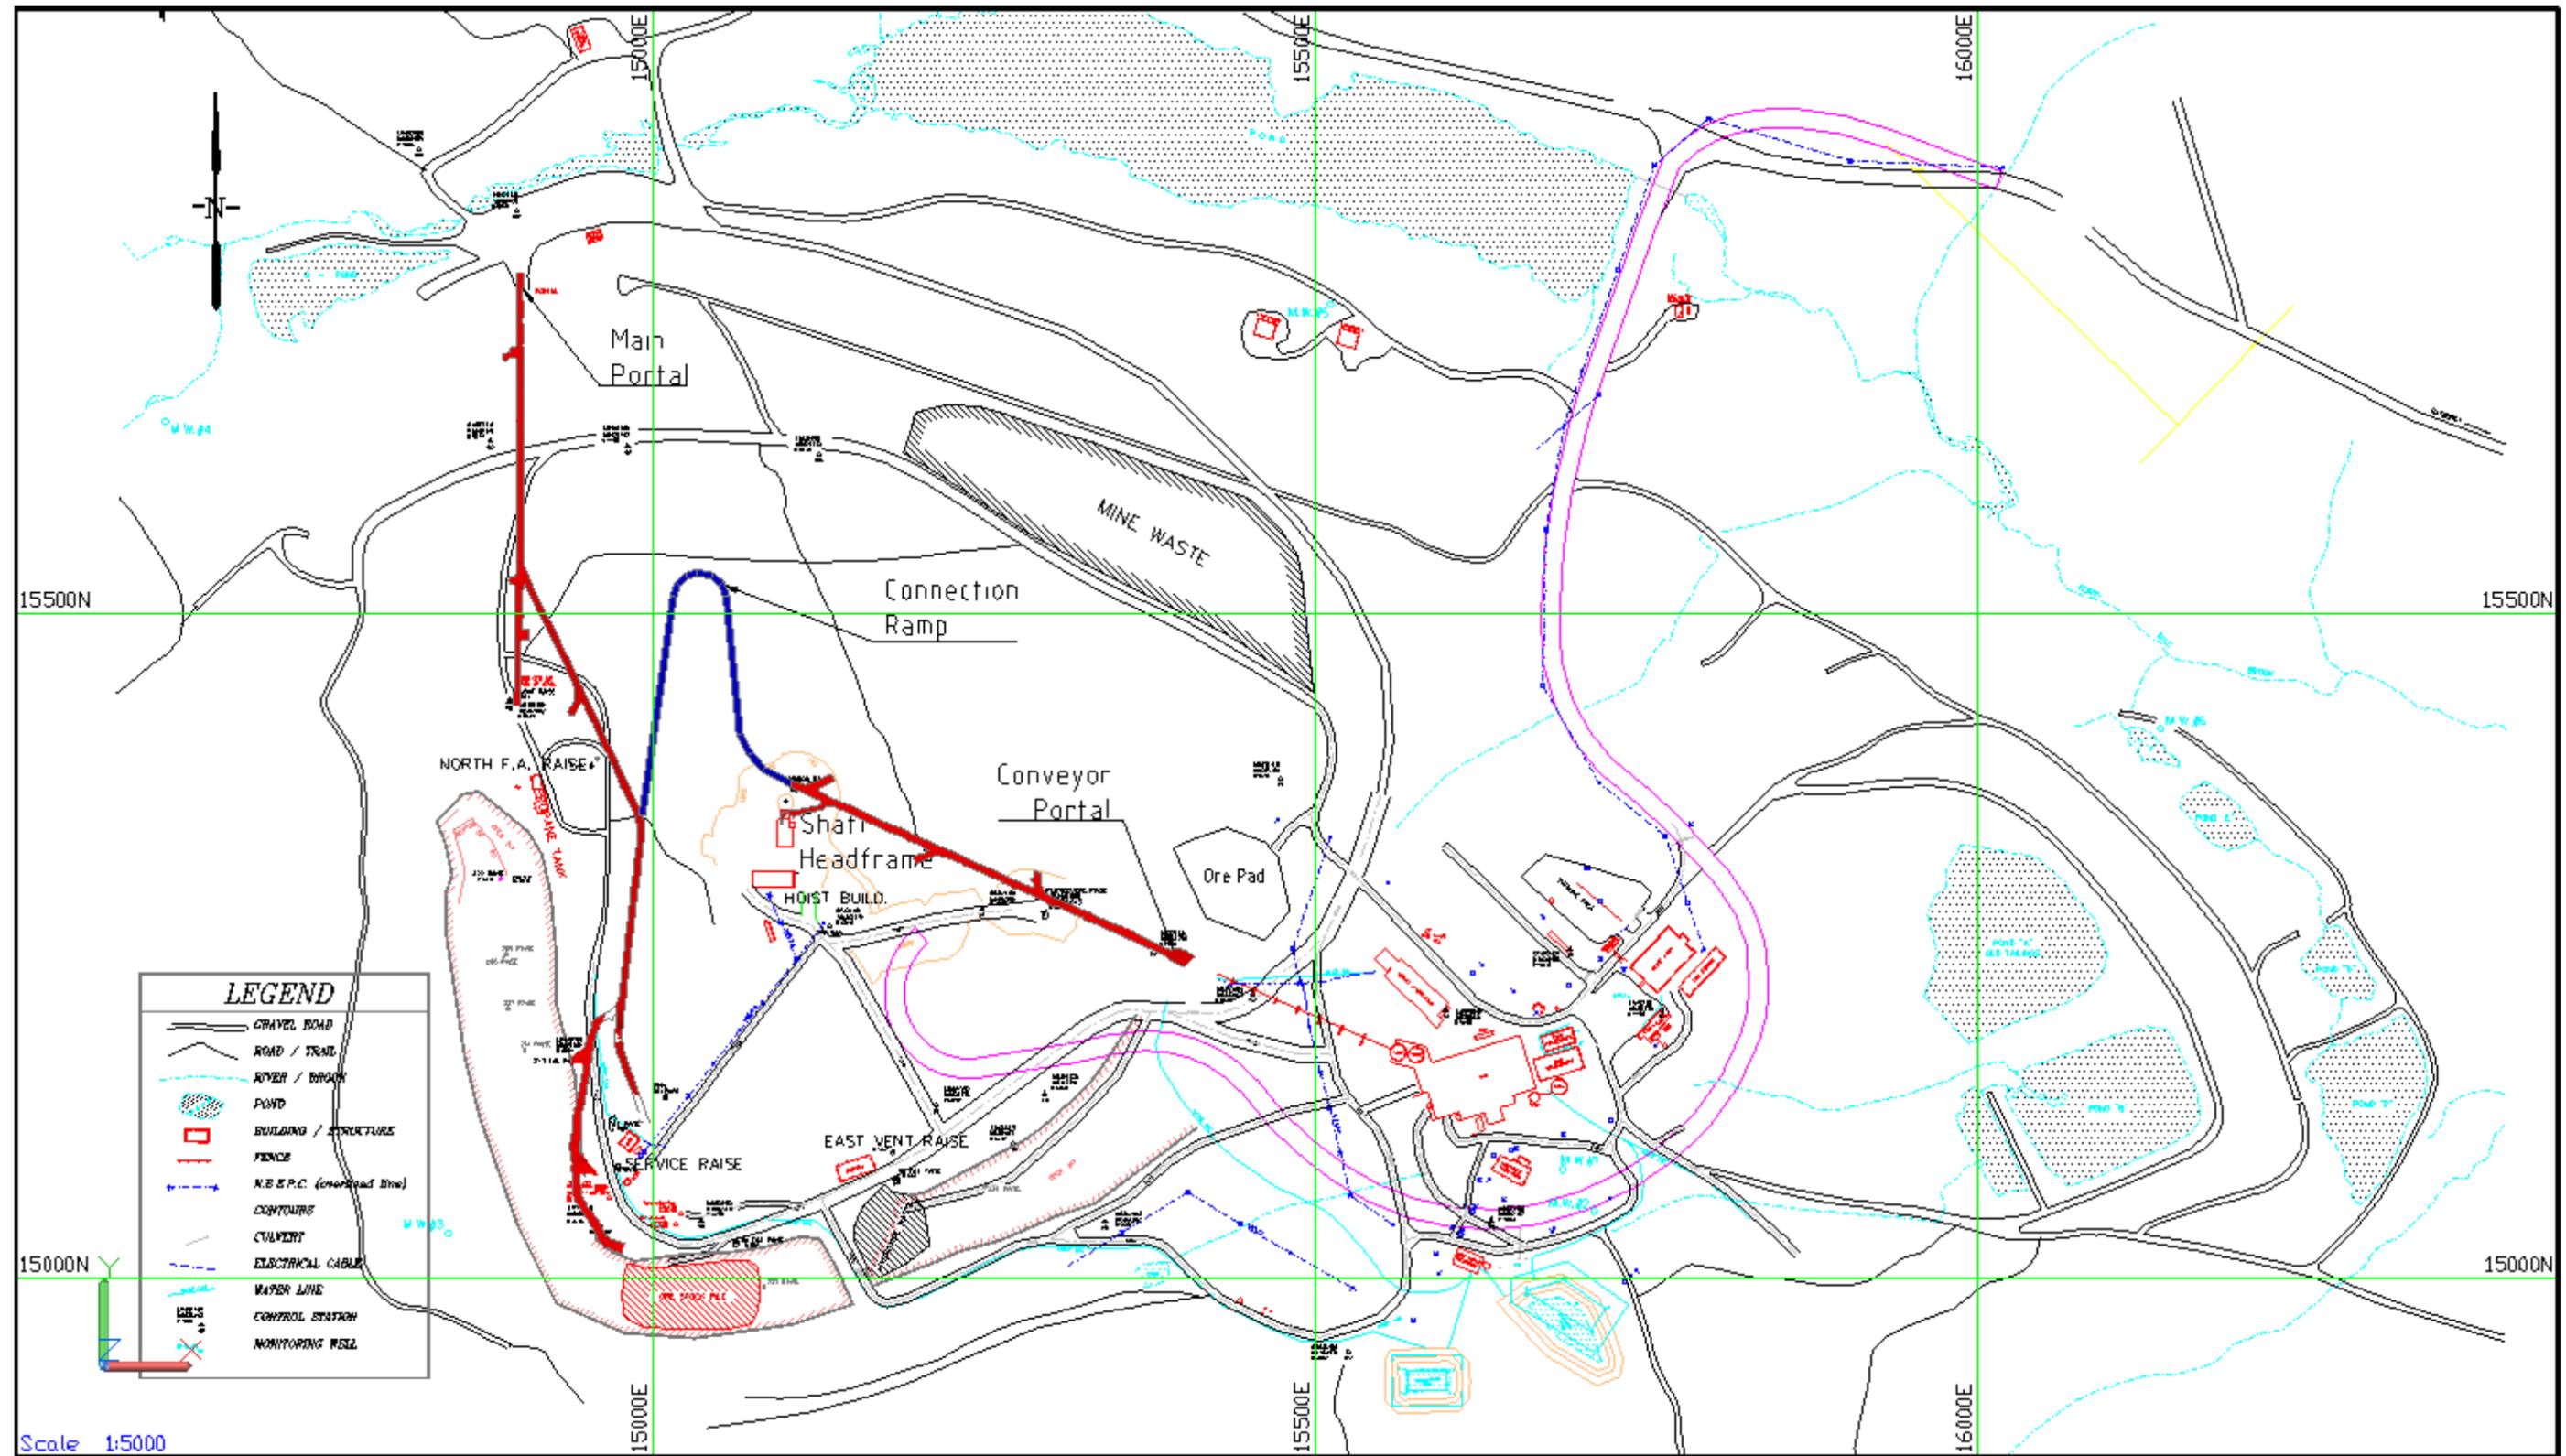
Caribou Underground Mine Major Surface Infrastructure and Major Underground Infrastructure Surface Projection View (Trevali 2014)
